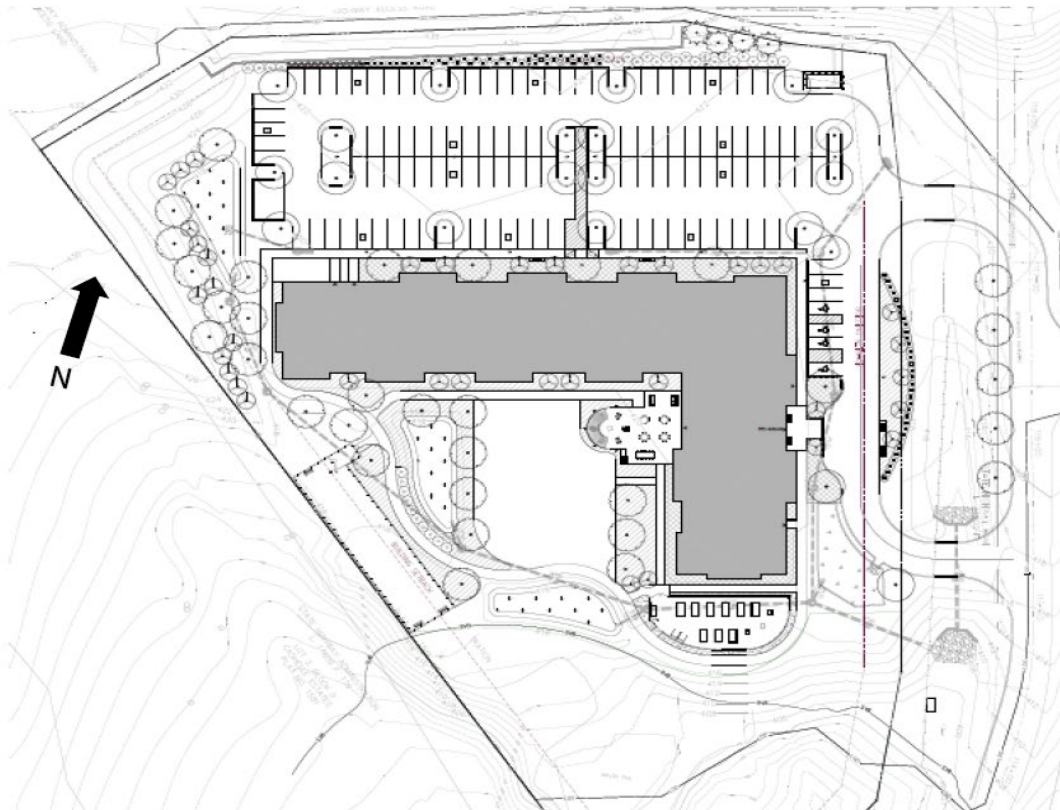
, pg. 8 – Staff Report, Landscape Plan
